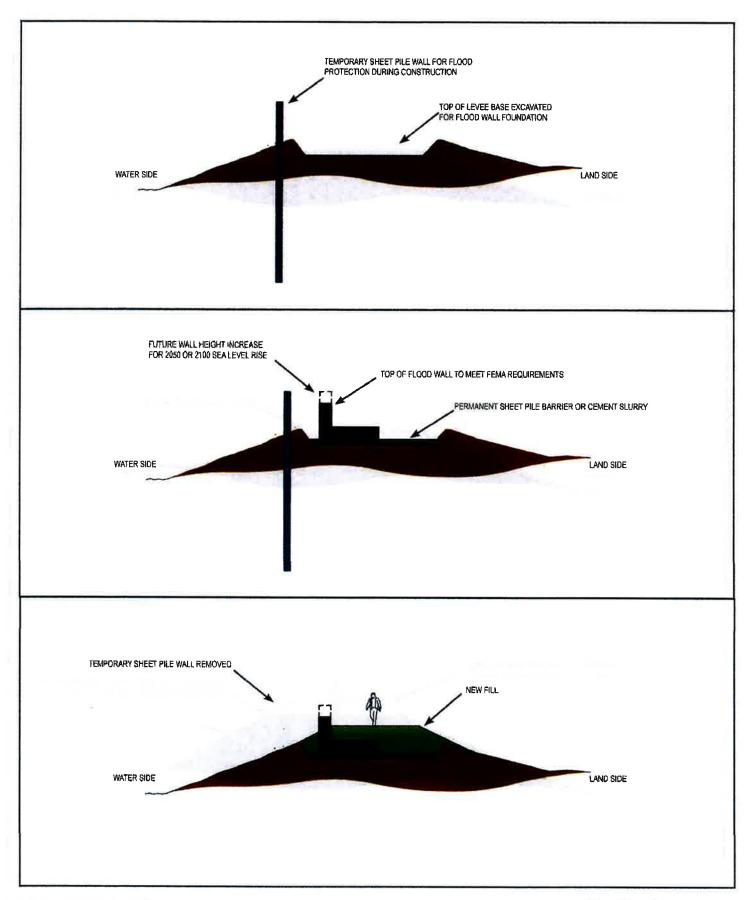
Typical Conventional Floodwall Cross Section Levee Protection Planning and Improvement Project CIP 301-657 City of Foster City, San Mateo County, California
